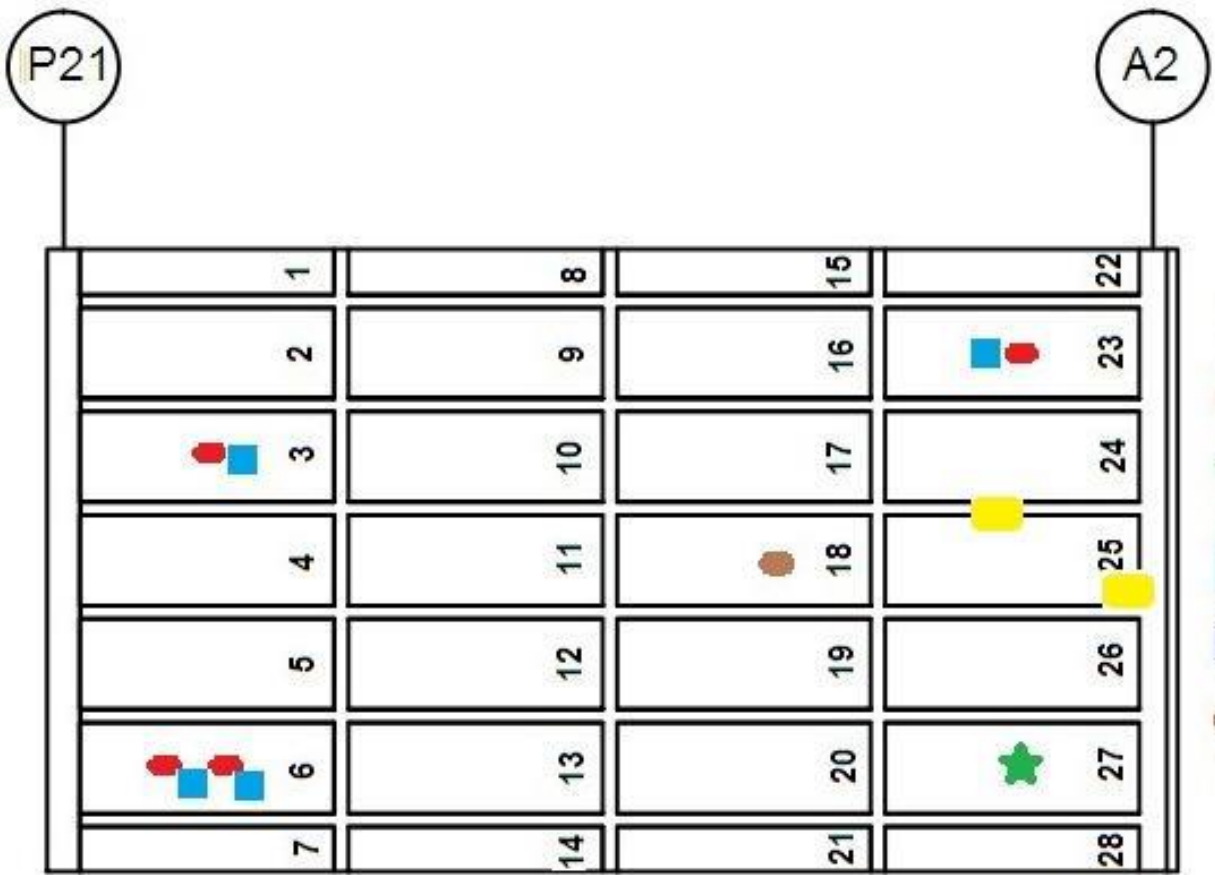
Test conducted at various locations between Pier P21 and Pier P22
